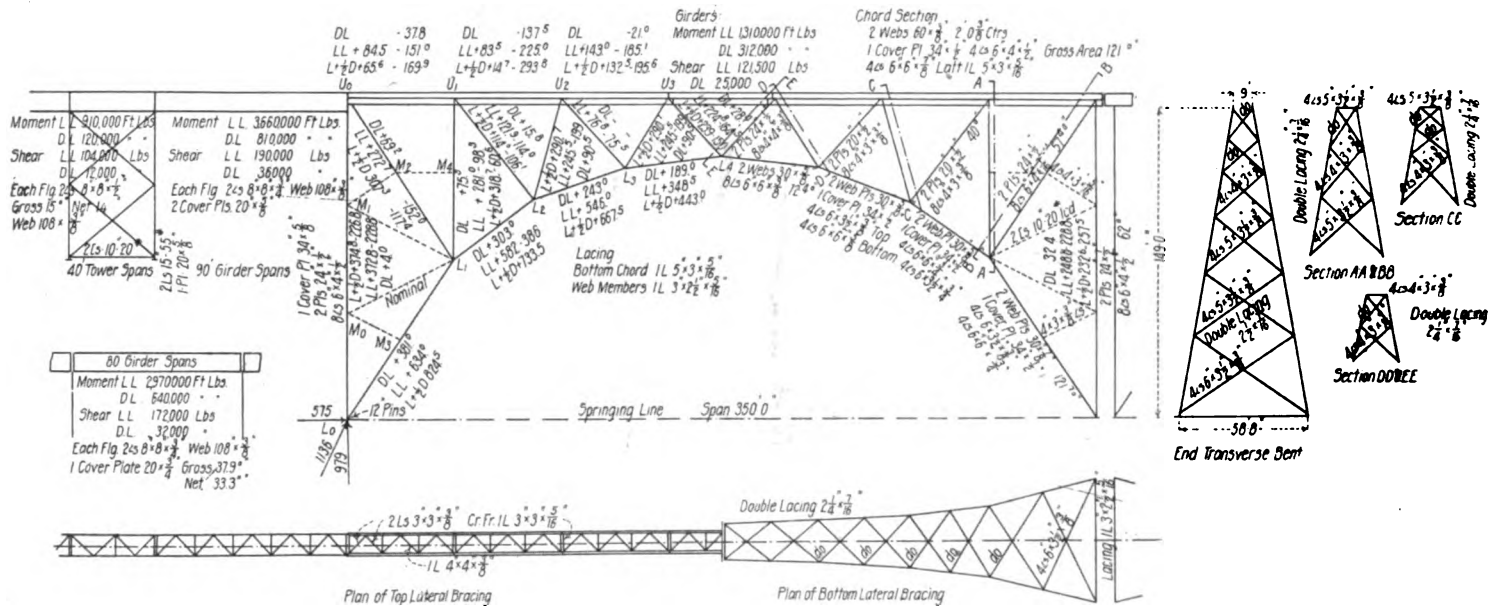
Stress Sheet for Arch Span, St. Croix River Bridge.
